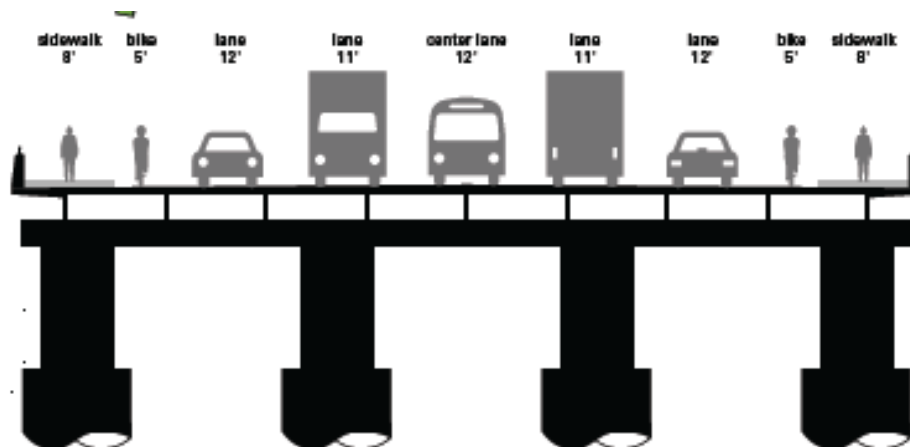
Proposed S Lander Street Overcrossing Typical Cross Section
